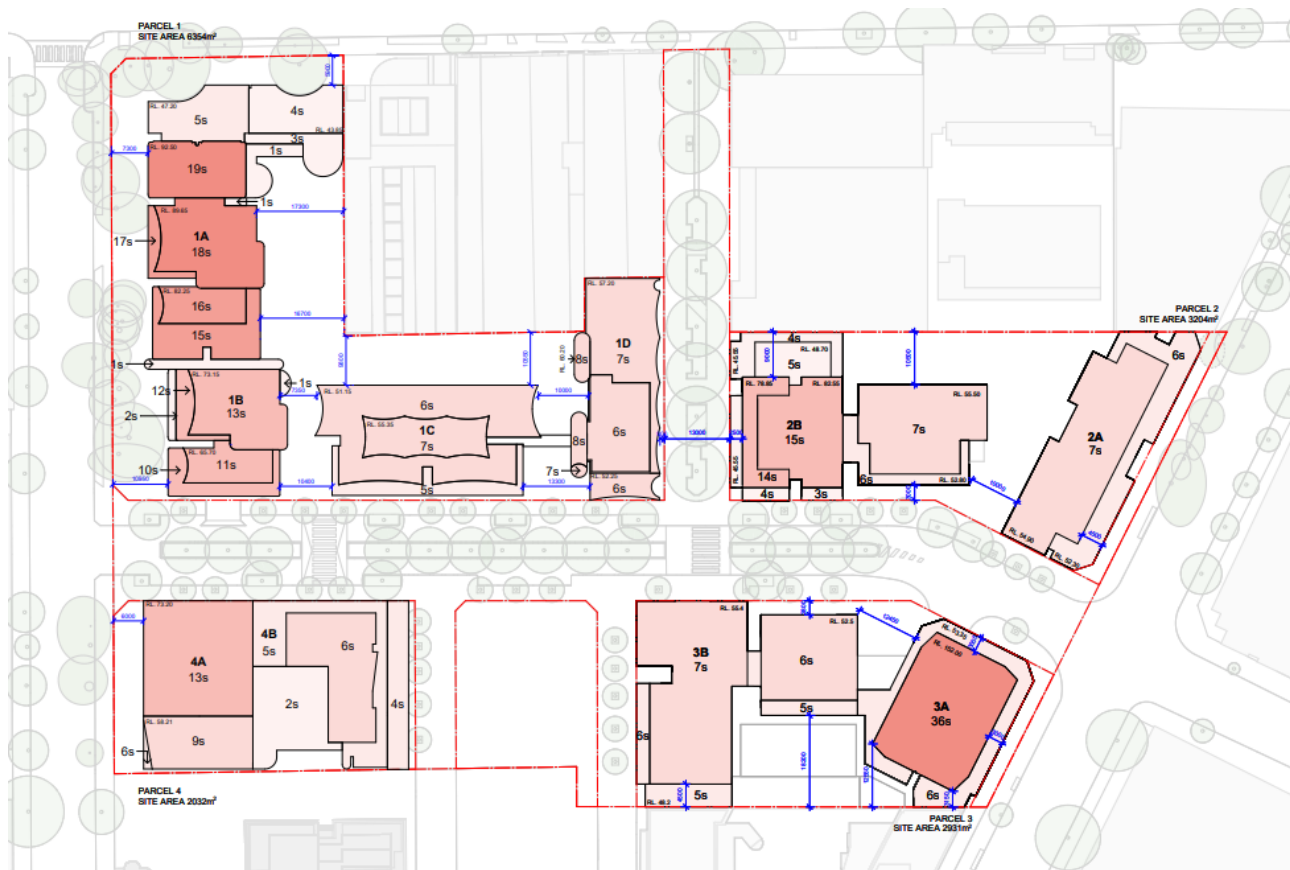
Precinct layout plan showing separation, height in storeys (as-lodged)
